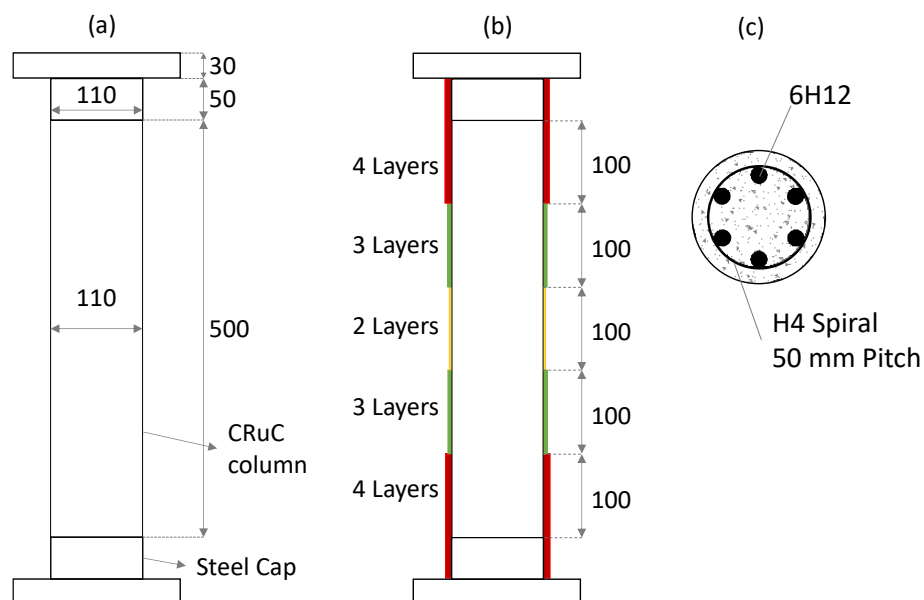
a) Geometry of the CRuC base-isolator, b) AFRP layout, c) Detailing of the reinforcement (units in mm)
